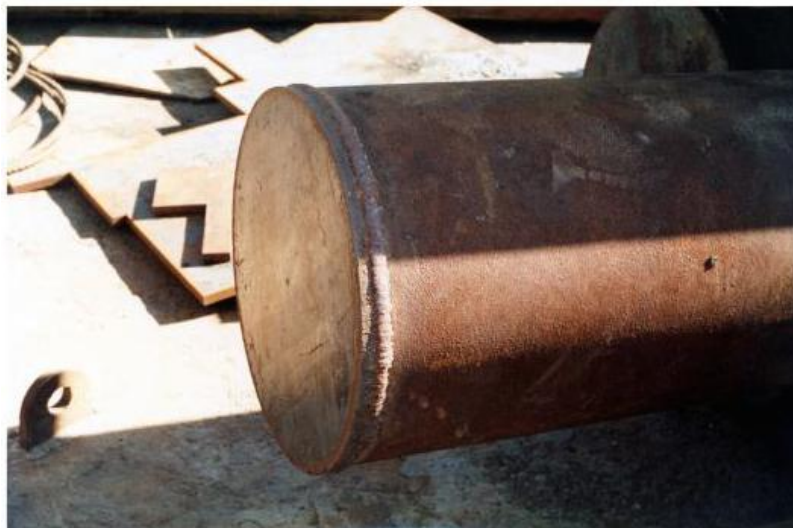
Closed-ended steel pipe pile (Pile Buck 2018)
